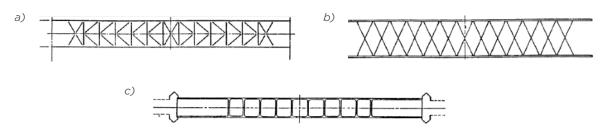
Different types of bracing (Chen & Duanbridge, 2000) a) K-type of bracing; b) Diamond type of bracing; c) Vierendeel type of bracing
